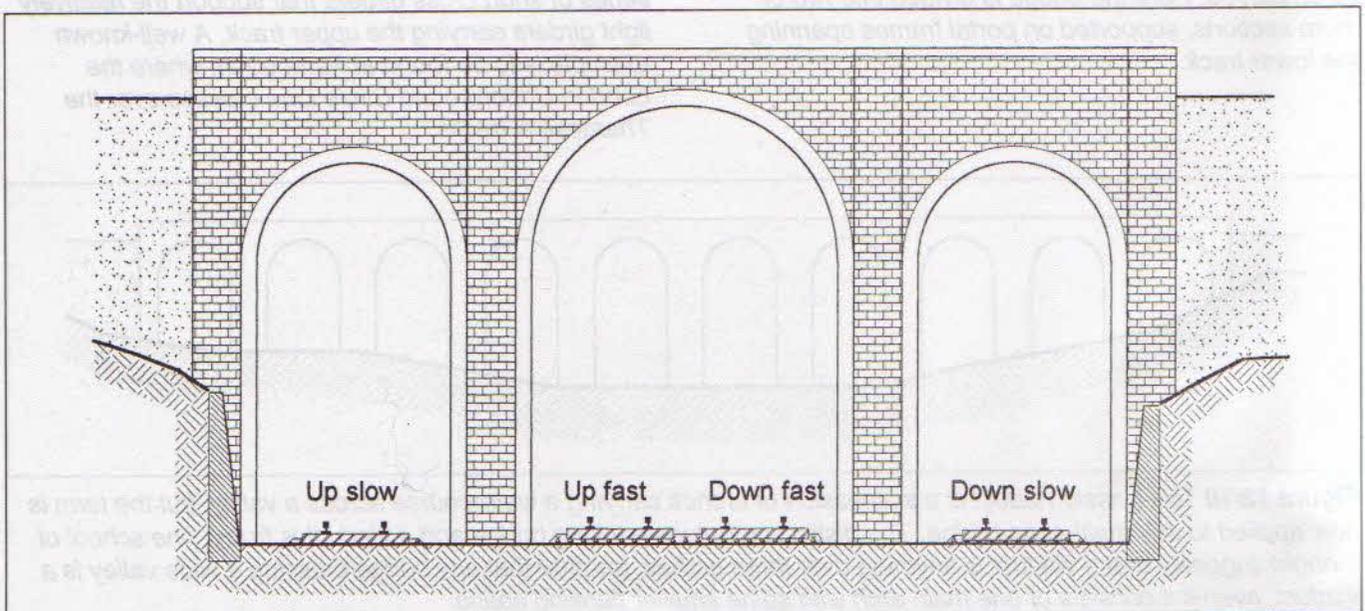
/7 The skew masonry bridge is one of the more complex of civil engineering structures, since the arch courses are arranged as a spiral. Thankfully, none of this affects the modelmaker. The point to bear in mind is that although the side elevation shows an elliptical arch, when viewed along the bore the cross-section is a semi-circle.
